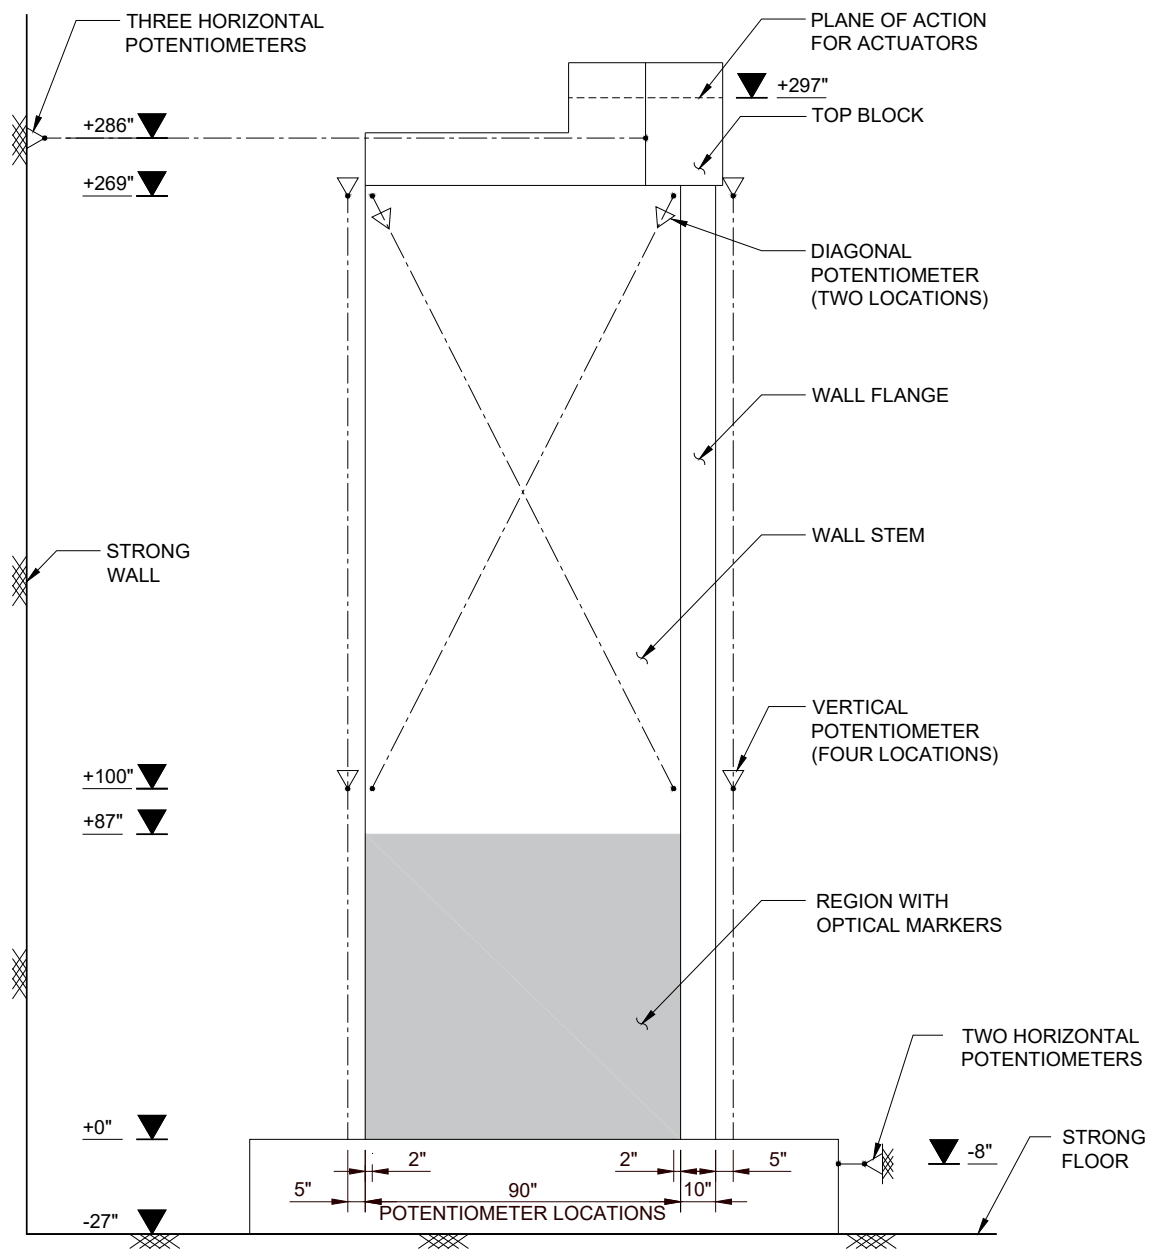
Wall instrumentation (elevation view of wall stem) (1 in. = 25.4 mm)
